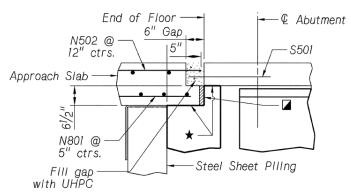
Transverse joint between precast concrete approach slab and bridge deck (Belden-Laurel Bridge)
